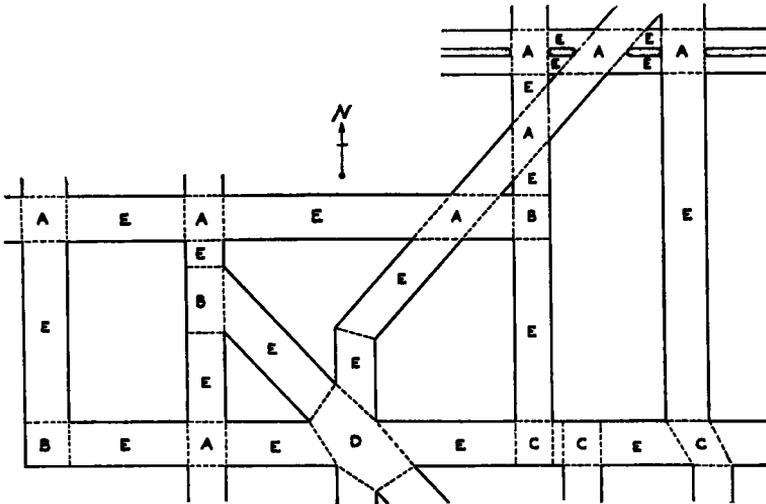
Sample Street Layout Showing Various Types of Blocks and Intersections
